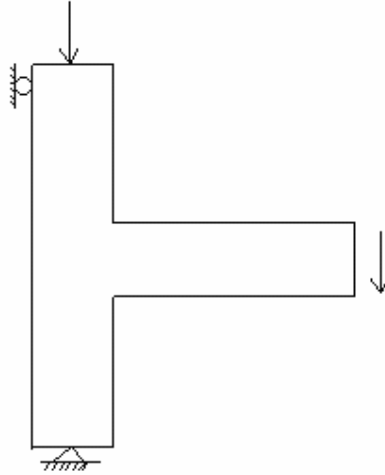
Loading arrangement and boundary condition of the beam-column joint
